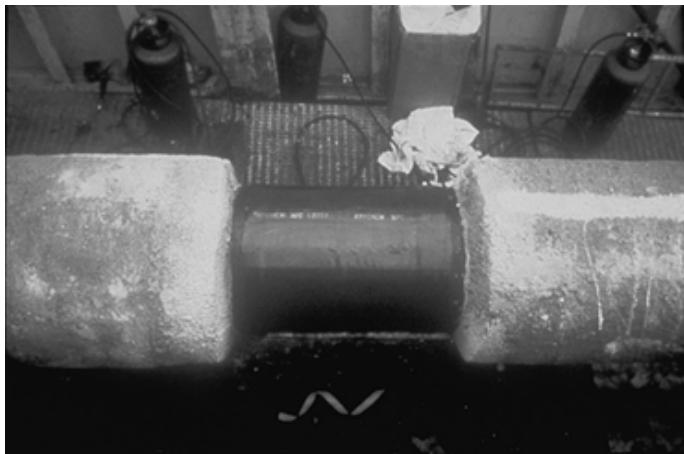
Finished Joint with Wraparound Sleeve Annular Space to Be Filled
